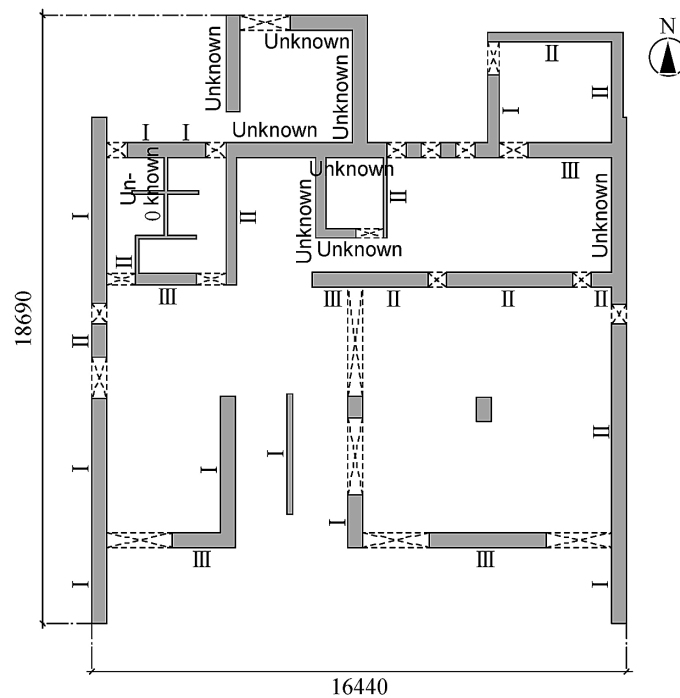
First floor plan and damage levels of masonry walls of Bam Tourist Inn.
